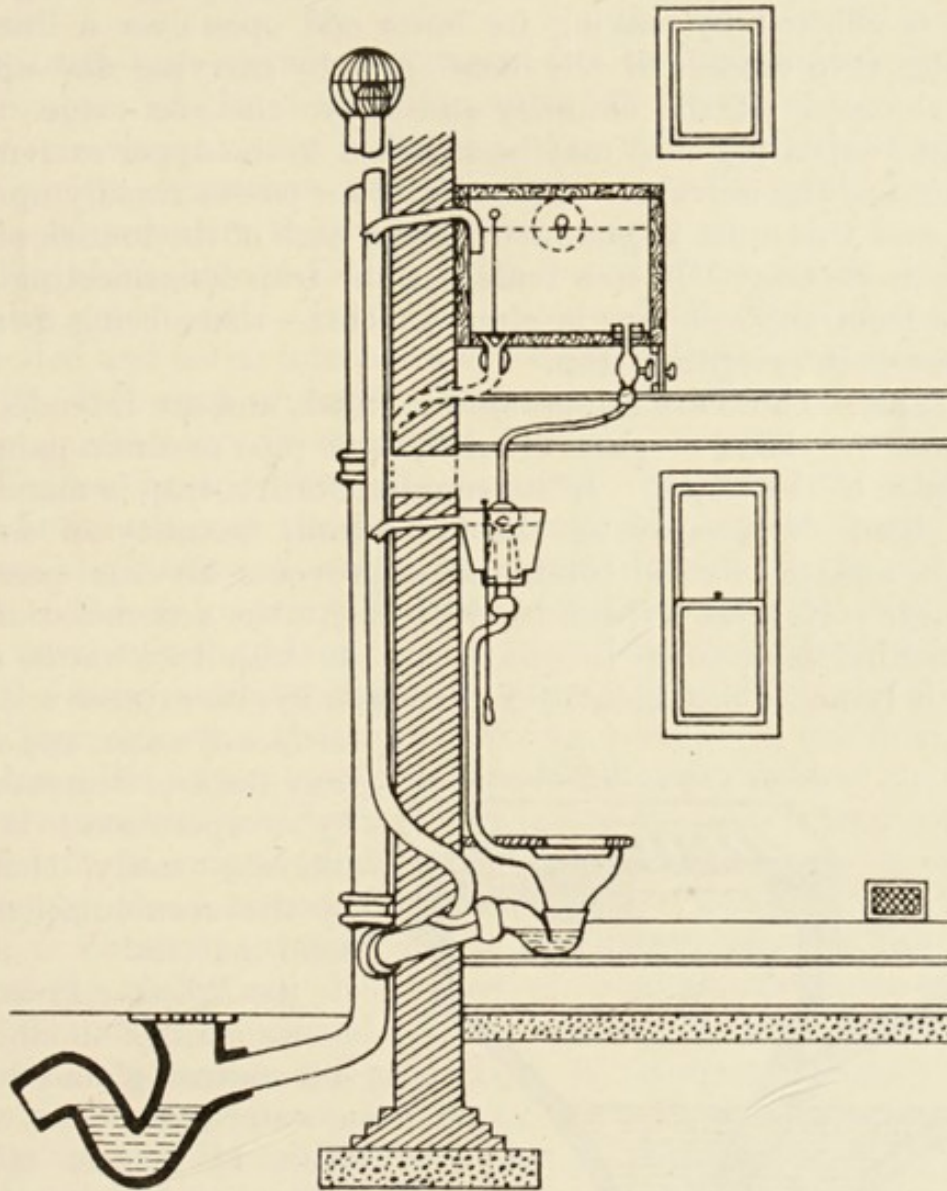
To illustrate the proper arrangement of a water-closet; the water-waste preventing cistern; the soil pipe and its ventilation with the intercepting trap.
